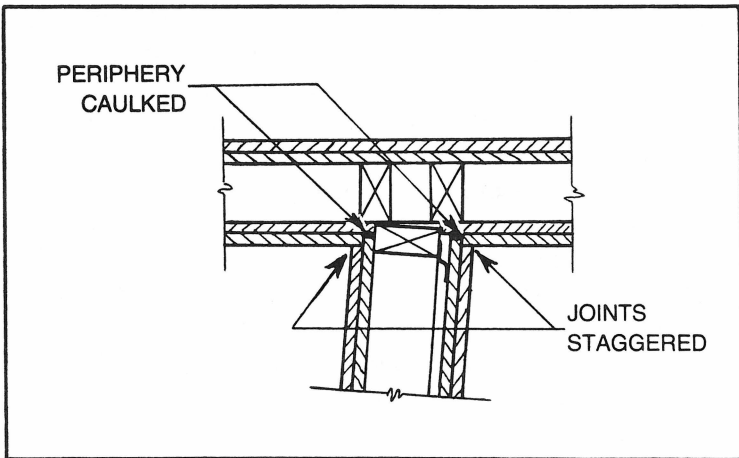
Plan for staggering gypsum layers at corner joints to reduce noise leaks.
